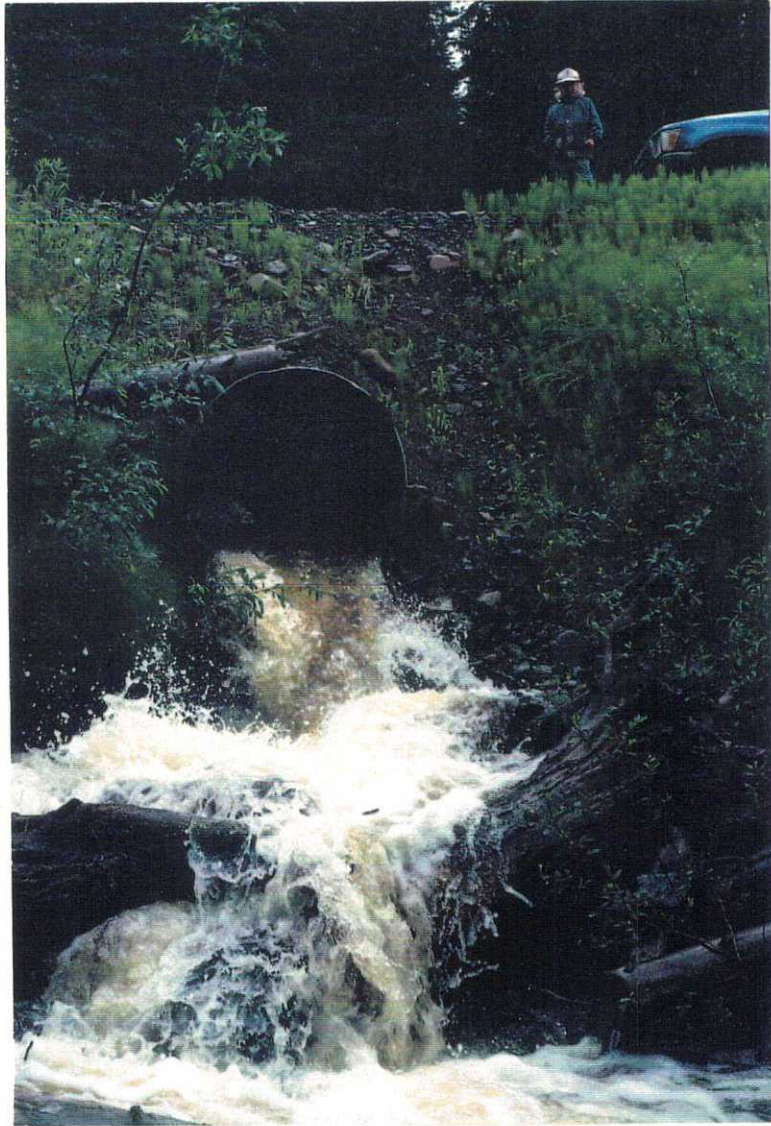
Trib 46-700-144 .5 km Grizzly FSR) This impassable culvert should be replaced to restore access upstream. Dolly varden were gee-trapped up to this crossing, but not above.
